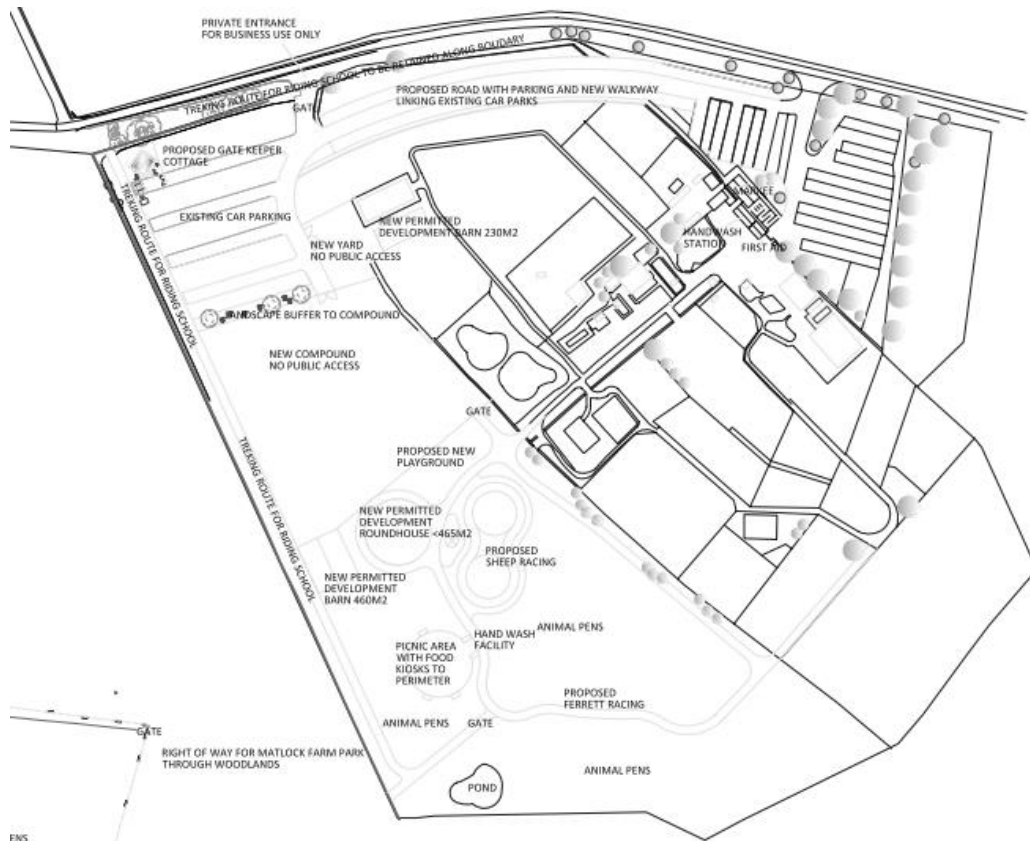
Proposed site plan with proposed managers dwelling in the north west corner of the site
